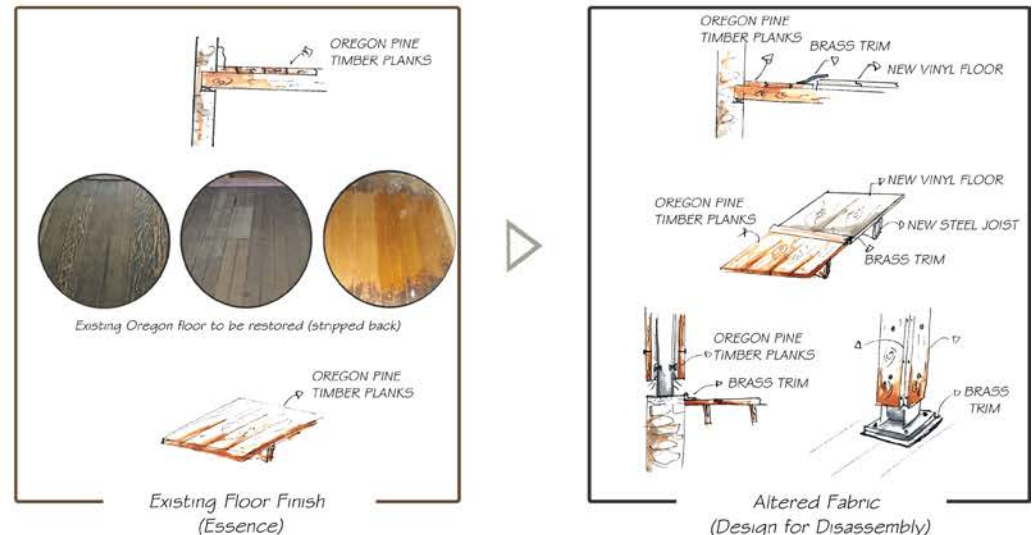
Floor and column exploration sketch, not to scale (Author 2018)
